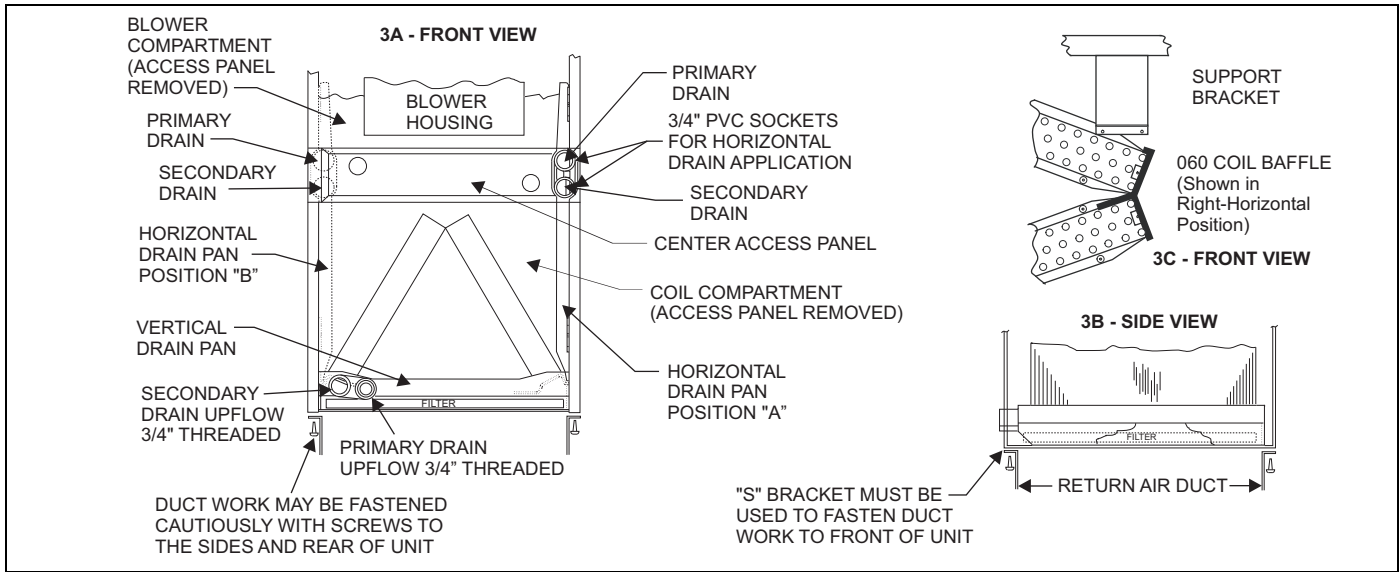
Filter Access & Drain Pan Conversion / Coil Baffle
